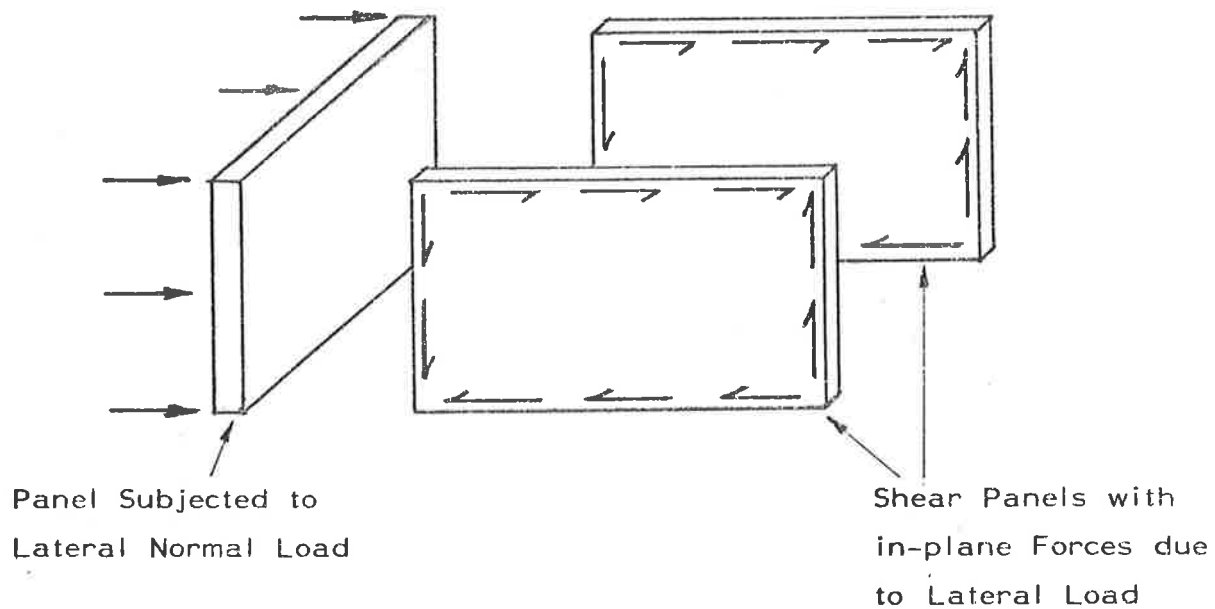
In-plane Shear Caused by Lateral Loads on a Brickwork Structure
